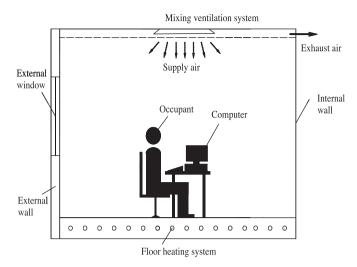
A typical office room with floor heating system and mixing ventilation system.
